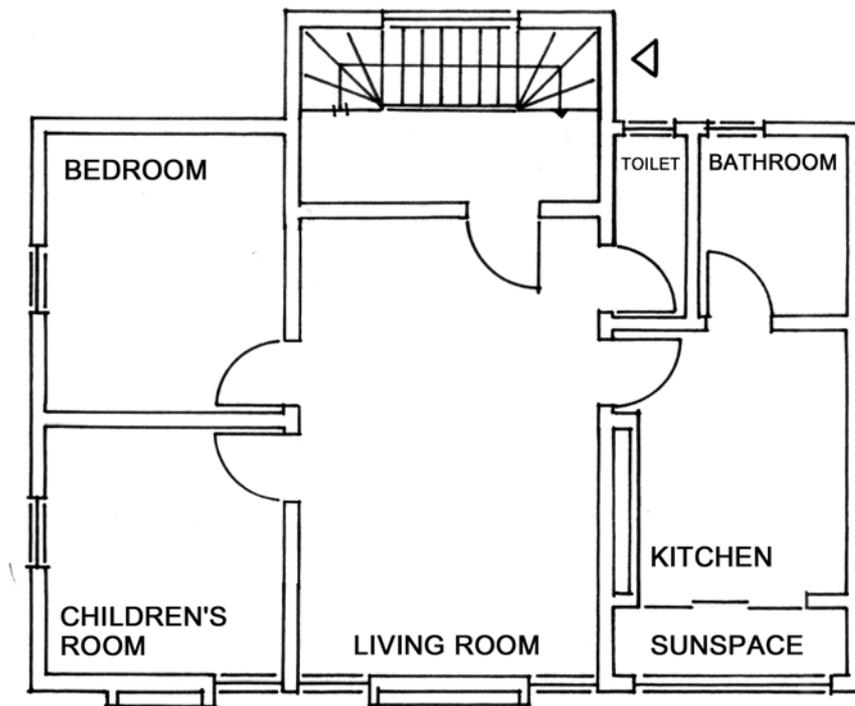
Plan of type D₄ dwelling (multi-storeyed housing facing mainly south); Scale 1/100
